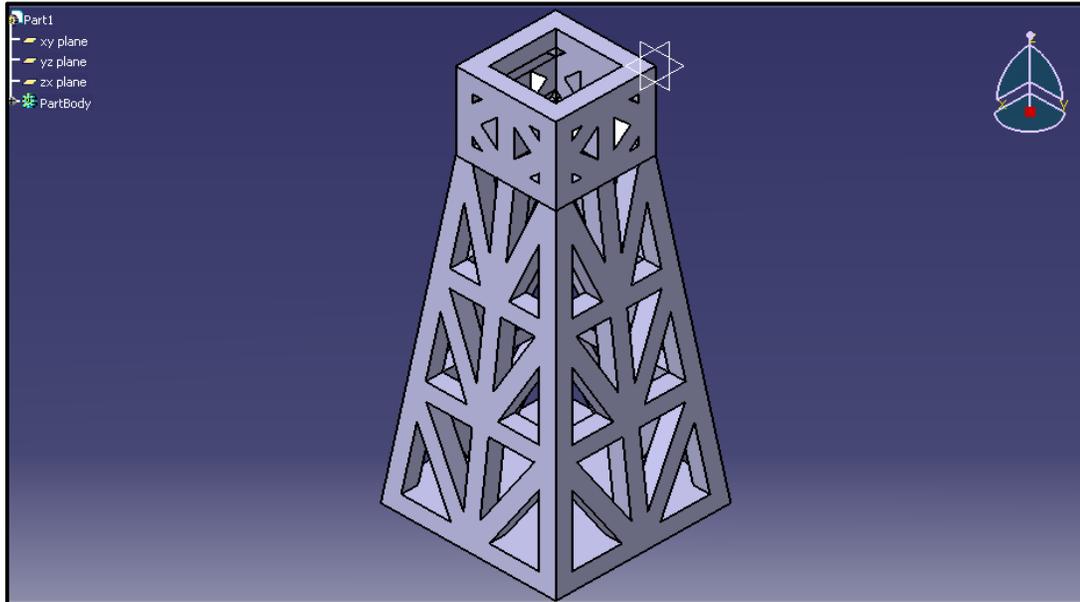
Jacket Structure drawing (isometric view) with 2 m x 2 m cross-sectional area of steel members.
